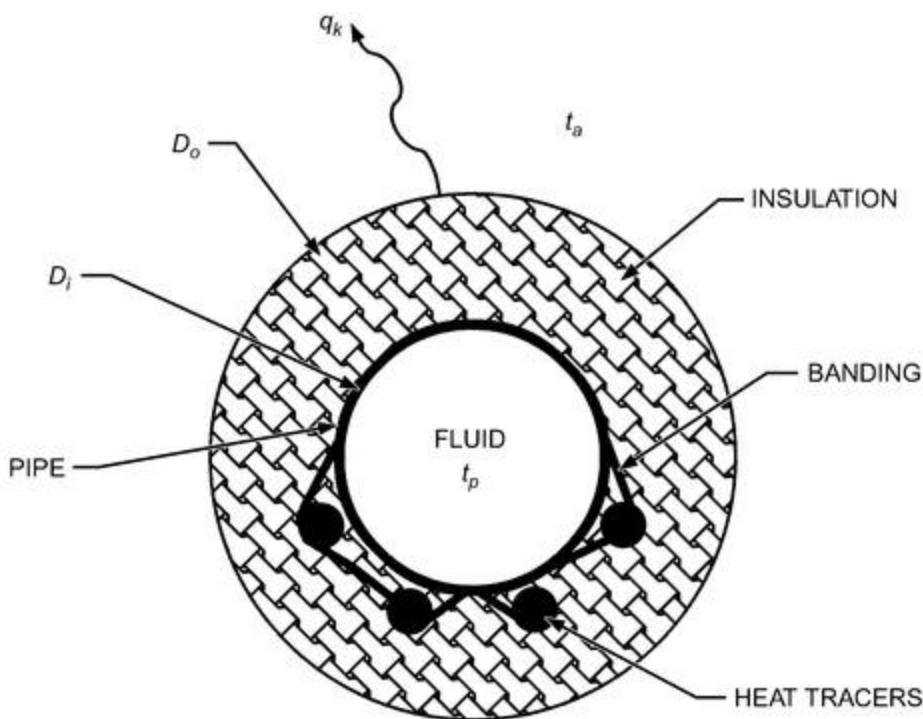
Typical Heat Tracing Arrangement (Hydronic or Electric)
